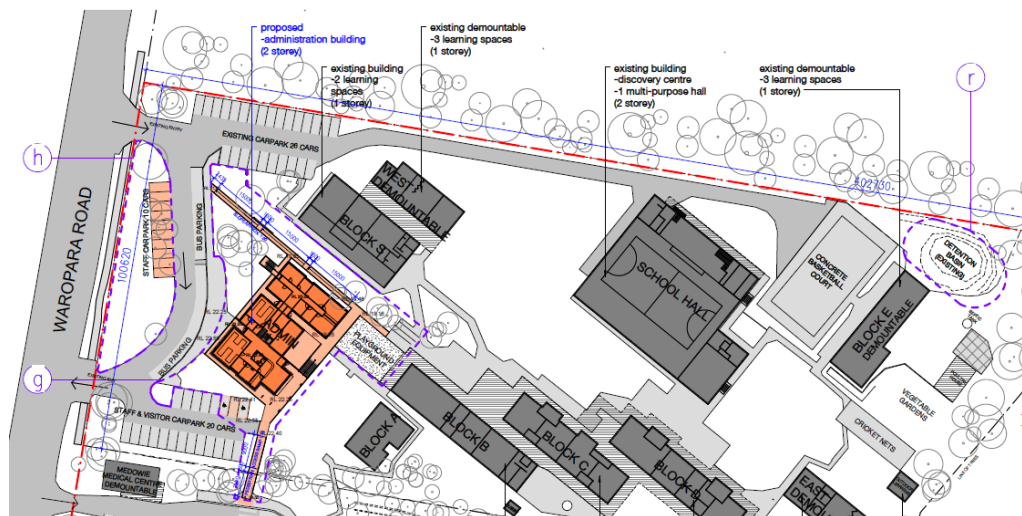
Stage 1 DA - Administration Building, Car parking and Embellishment of On-site Detention
